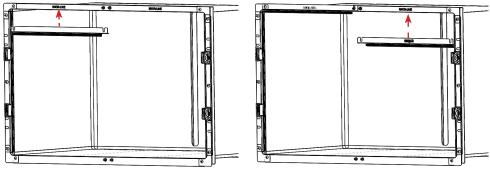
Left Head Seal Installation FIGURE 2.18 - Right Head Seal Installation
